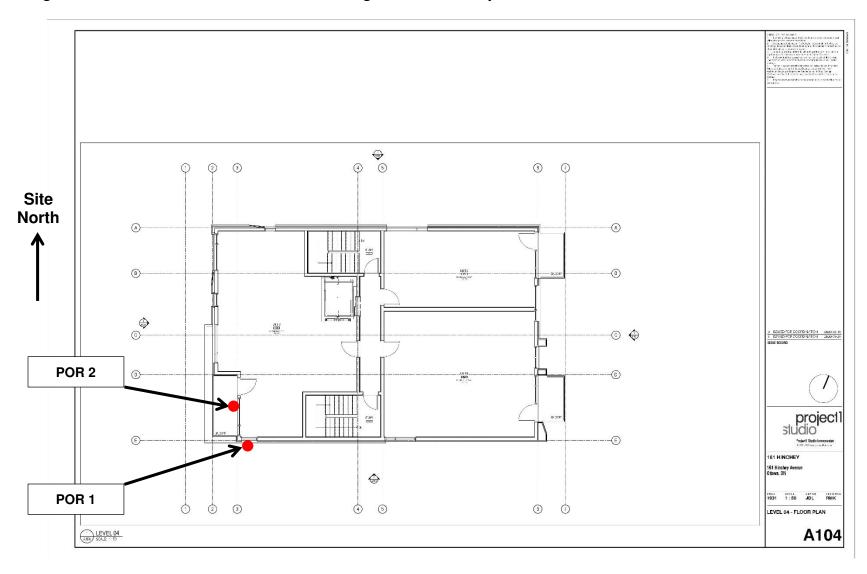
Site Plan showing Points of Reception (Source: Project1 Studio)
